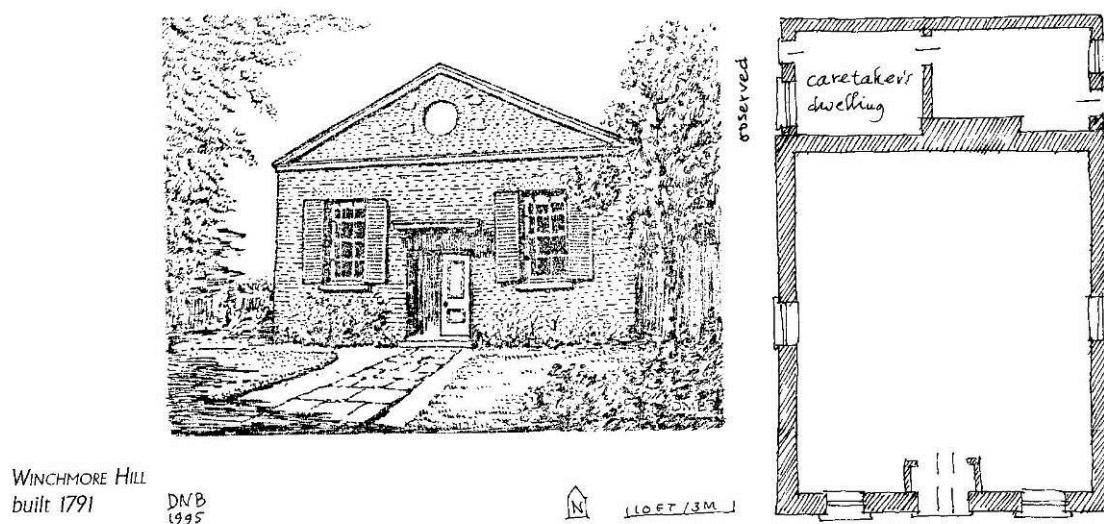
Main front and original ground plan of the building, *Butler* vol.1, p.434
